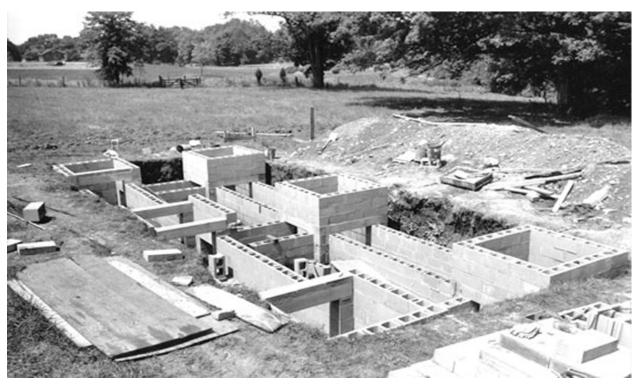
Simple Network of Underground Wells and Tunnels; Construction Concrete block, wood, earth, approx. 28' wide x 50' long x 9' deep (Source: aaycock.com/)
